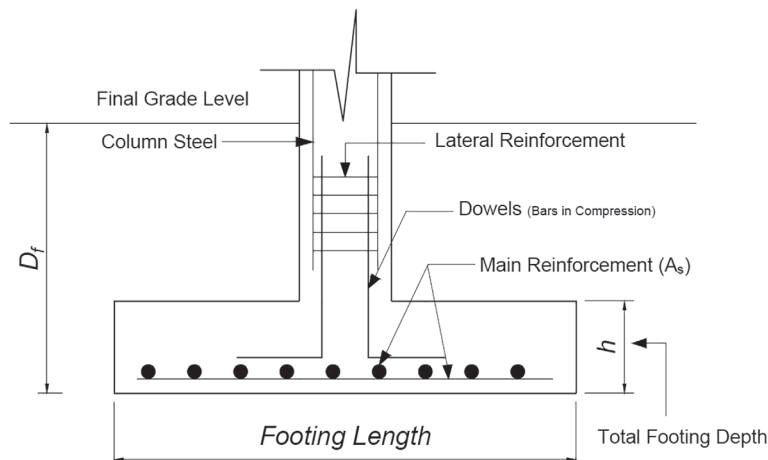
Isolated footing dimensions and reinforcement detailing⁵
